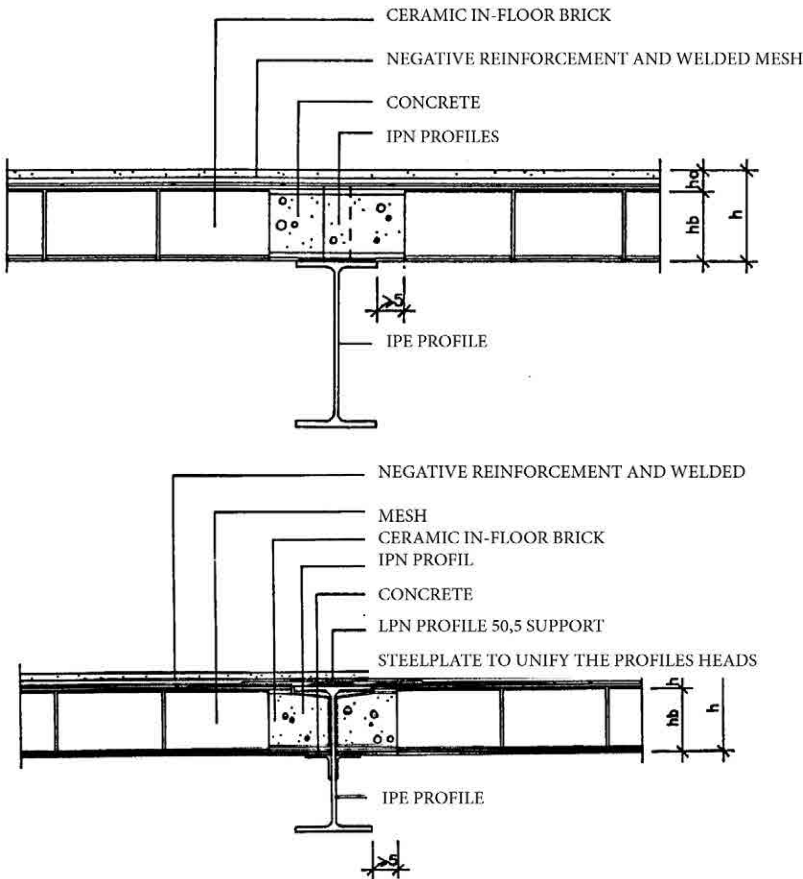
Steel joists on steel beam. In NTE (Normas Tecnológicas de la Edificación).
